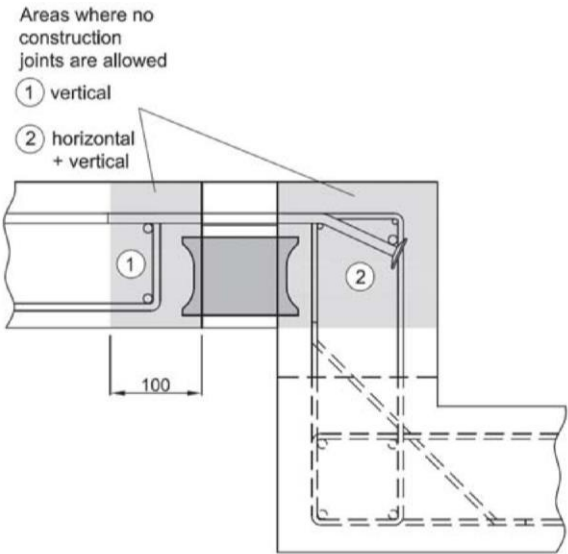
Reinforcement layout for height offset HIT-HP/SP MVX_OU
